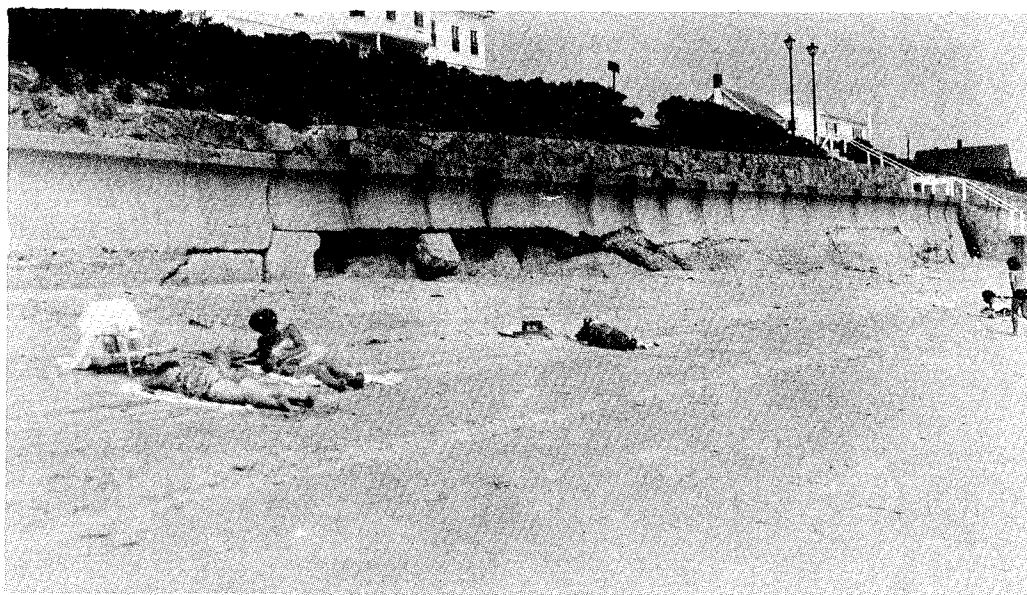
, AUGUST 1969. Looking along another section of seriously damaged wall within the same sector as shown in PHOTO 4.
